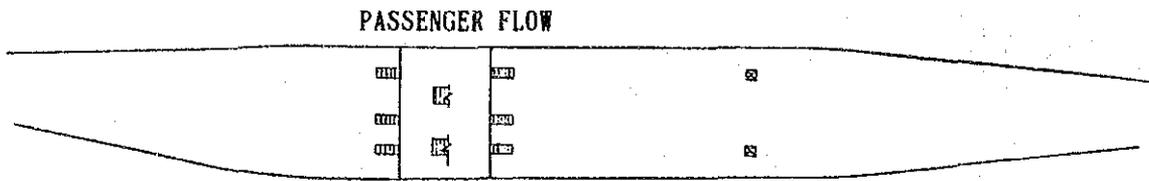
Track Layout Plan of Station Yard
